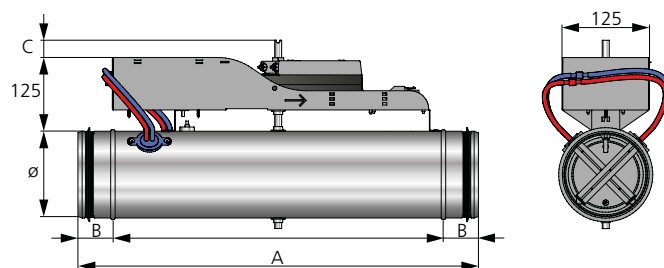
Dimensions, WISE Damper circular and WISE Damper circular with spring return.
